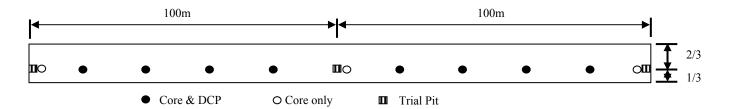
The details of the test sections of 200 m long for Zilla road (Z3024).
